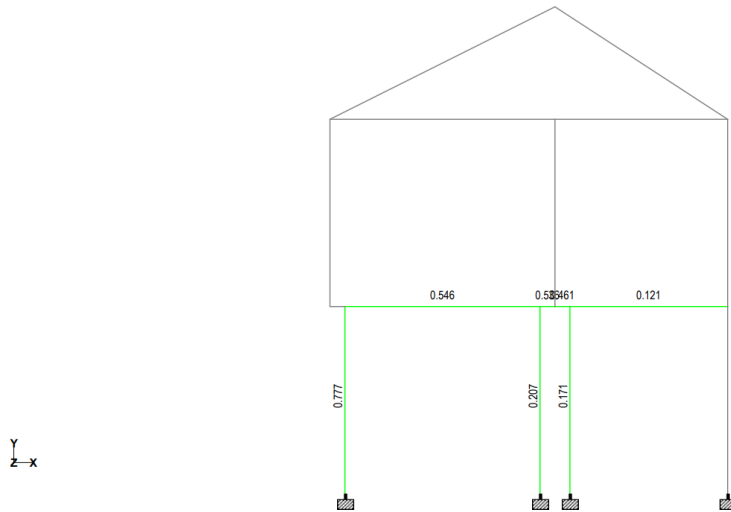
Steel strengthening kitchen stress ratio at mahudha timber lime structure
